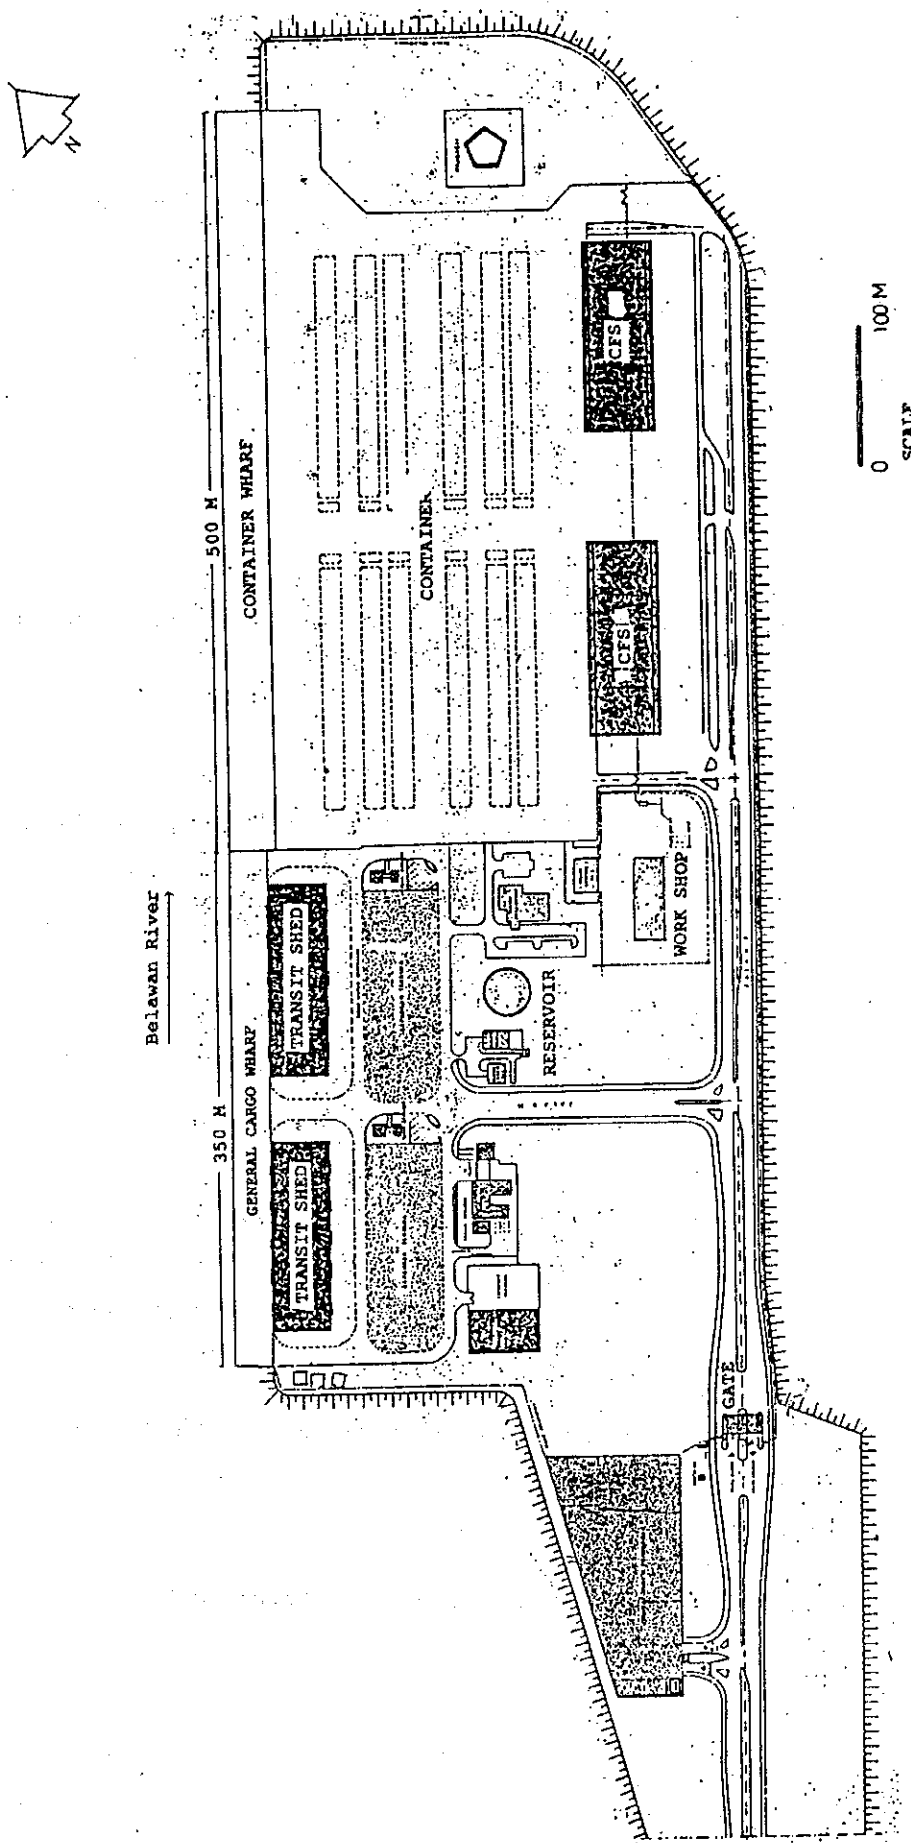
Layout Plan of Container Terminal at Gabion Base, Port of Belawan
